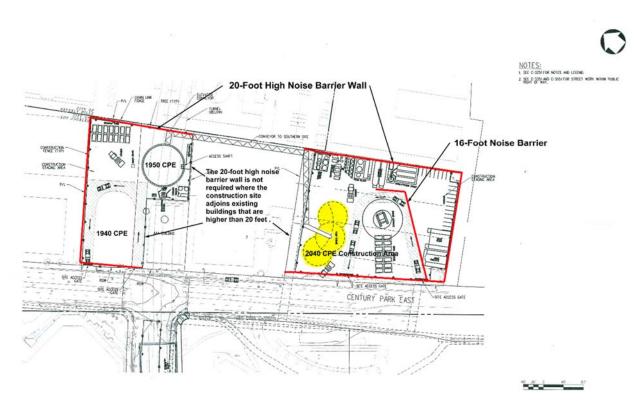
2040 CPE and 1940-1950 CPE Construction Site Noise Barrier Walls
